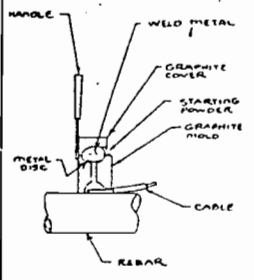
DETAIL D: ELECTRICAL SPLICES (TYPICAL)
